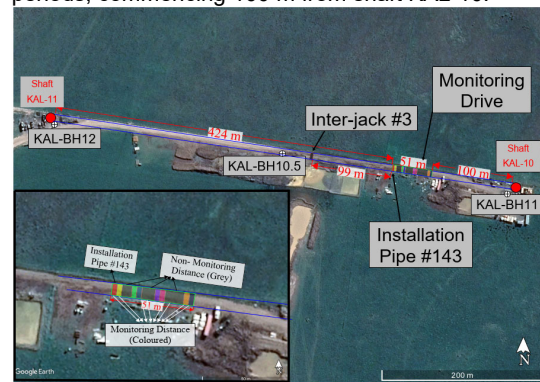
Pipe alignment and monitoring plan view (Tsang et al. 2020b)
